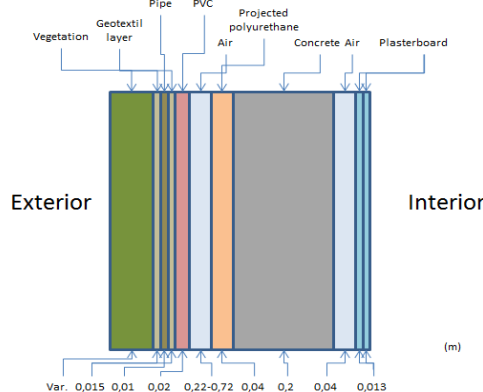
Living room wall layers of Level 2, Travessa do Patrocínio
